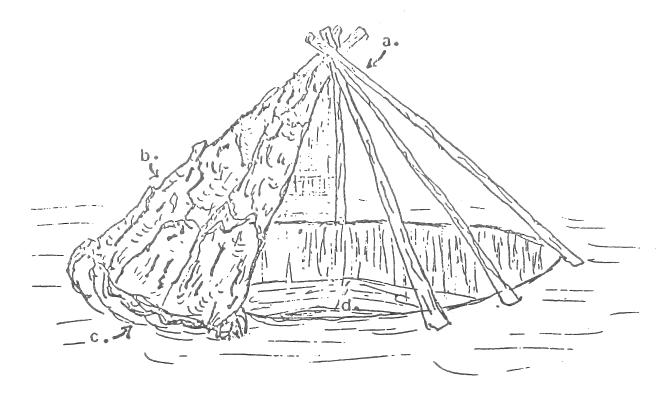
Nooksack pit-house dwelling. a) Poles tied together at the top, extending over edge of pit at the base; b) roofing material of cedar or fir bark; c) mounded dir around the base; d) sleeping platform above the floor level.
